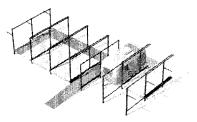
Fly-foam floor foundation with bamboo flooring inside the structure, and bio-composite choice deck outside the structure.
